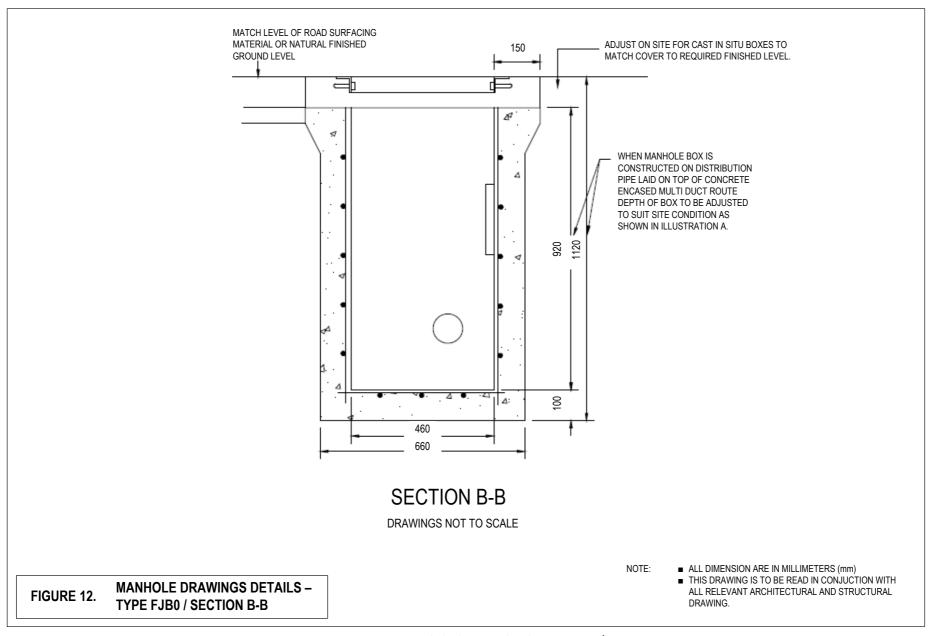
Manhole drawings details – Type FJB0 / section B-B
